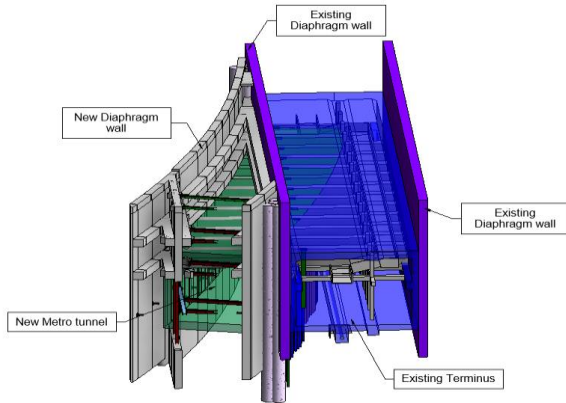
3D View: Cut&Cover excavation and final structure of the terminus.
